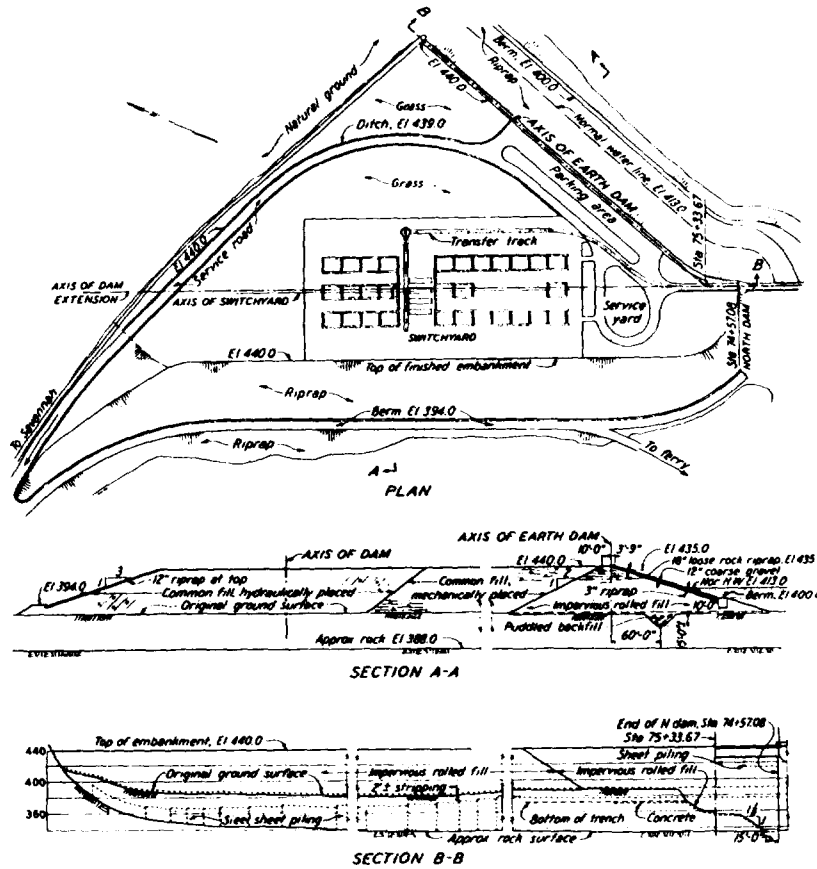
Plan and typical section of Pickwick Landing Dams north embankment.
